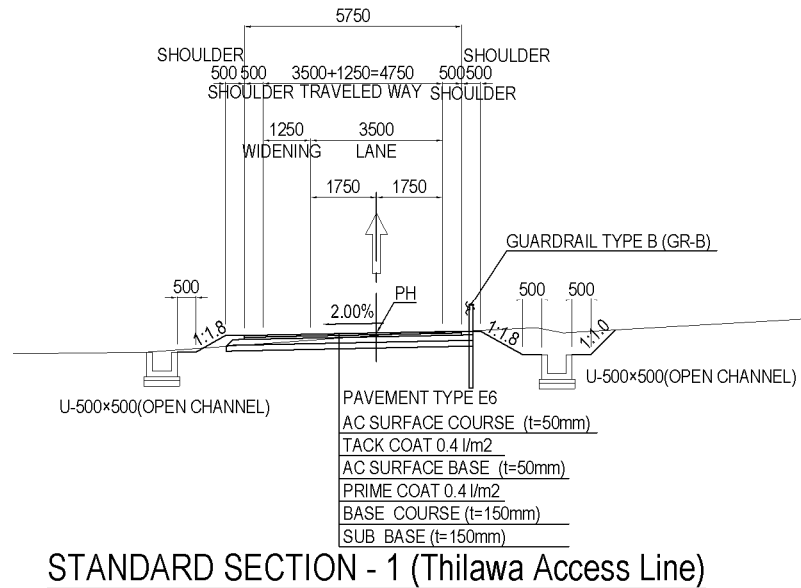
shows the pavement composition table of the earthwork section.
